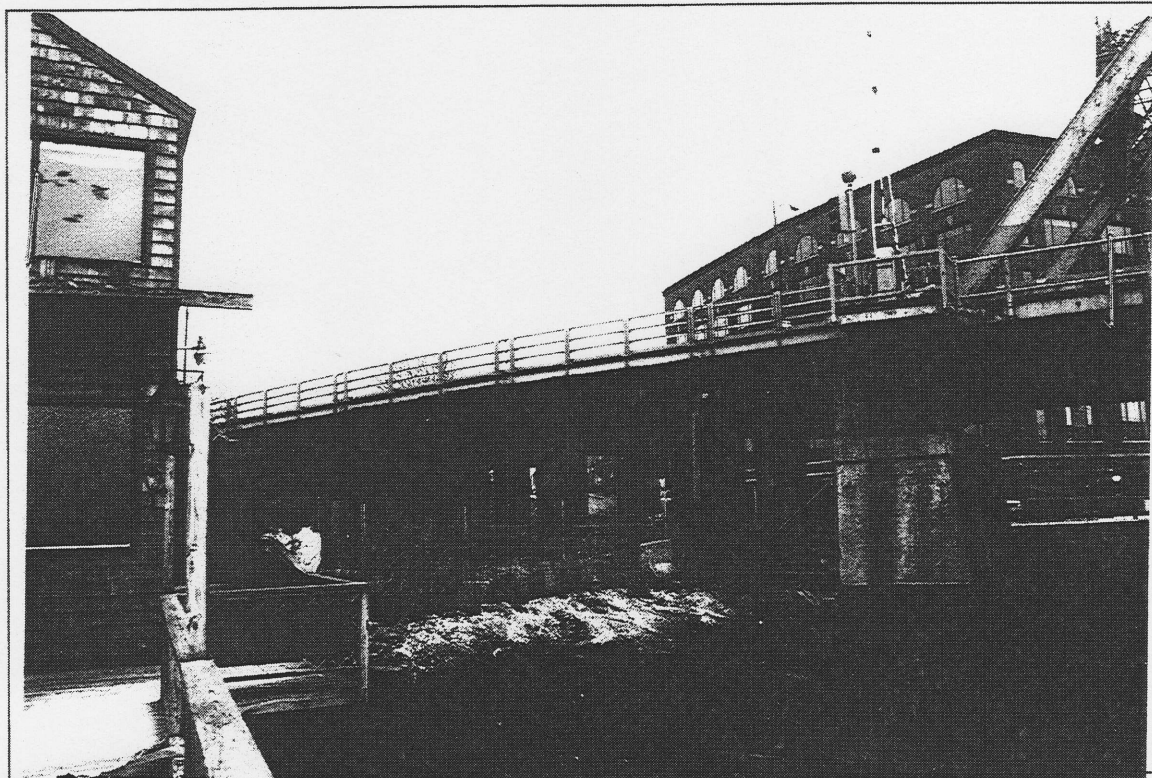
Portsmouth Approach , Substructure East Elevation and Memorial Bridge Abutment
